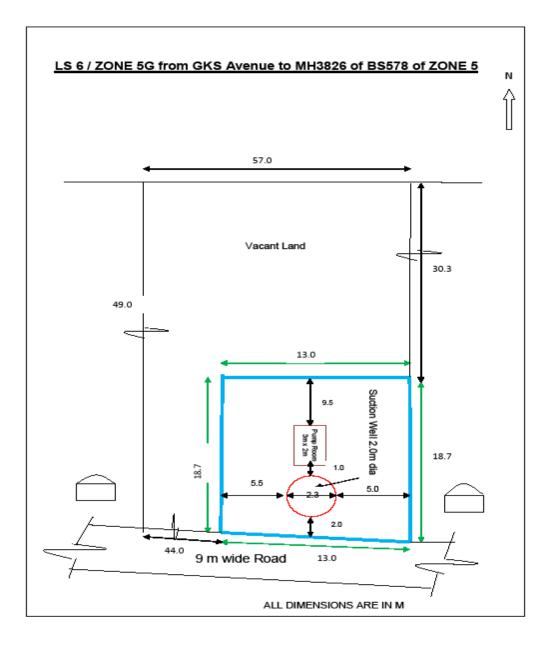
Site Set out Plans – Zone V (GKS Avenue)
